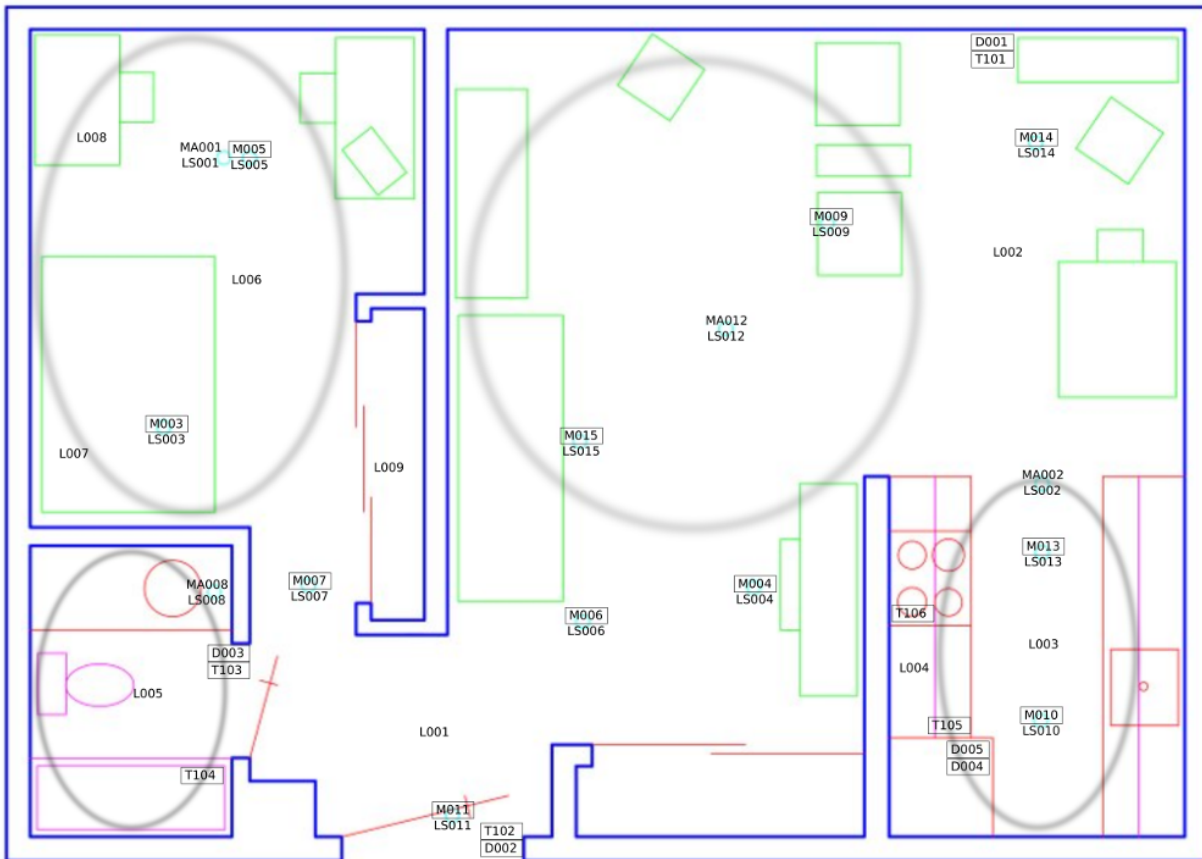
Floor plan and sensor placement for the testbed hh115.
